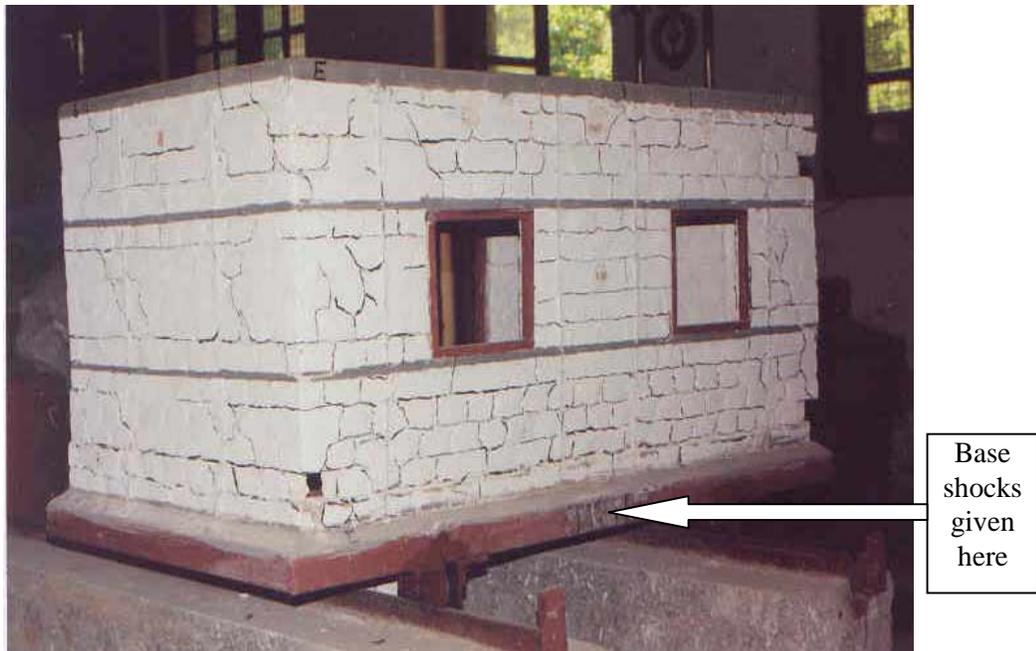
Building model with horizontal bands and containment reinforcement after 60 base shocks
